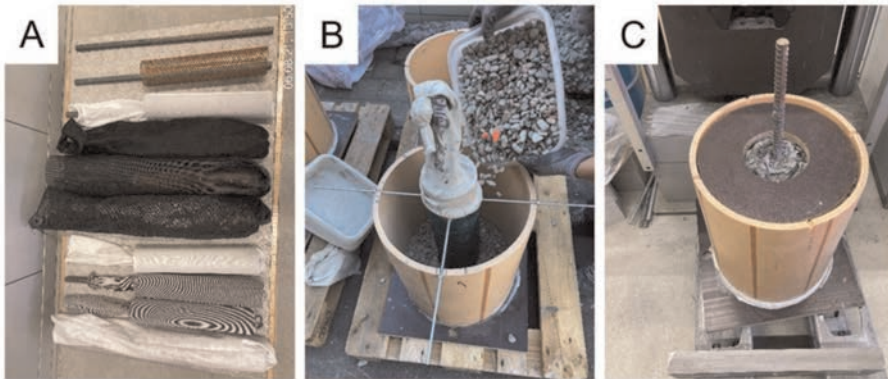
A) samples with anchor tendon and geotextile bag prepared for grouting, B) preparation of the gravel layer and hole-space, C) application of the ring plate.
